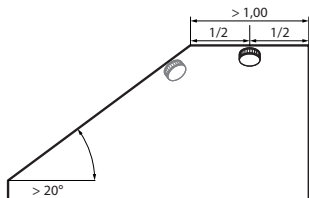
Straight mounting surface at least 1 m long and 1 m wide
